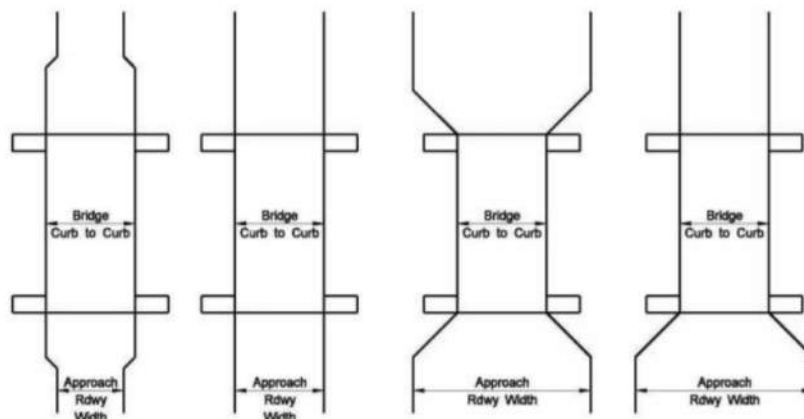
Approach Roadway Width and Bridge Width
